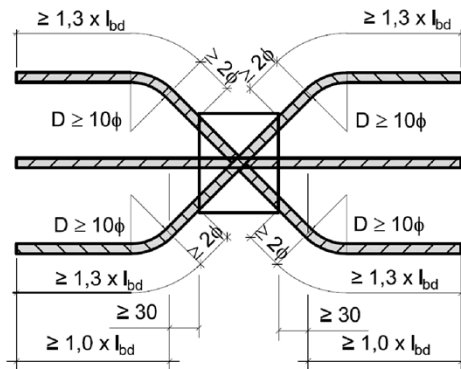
Horizontal inclined bars and straight bar for Schöck Isokorb® Type H-VV-NN, top view
